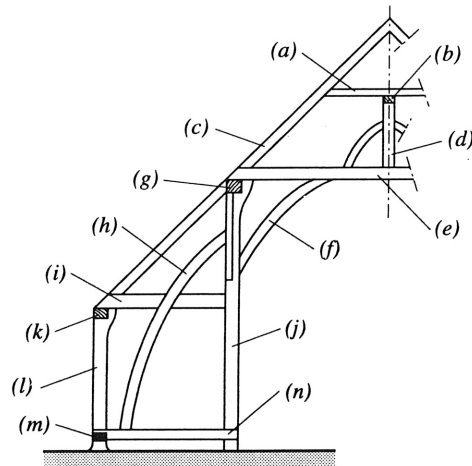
Aisled frame. (a) Collar, (b) collar plate, (c) rafter, (d) crown post (e) tie beam, (f) arch brace, (g) roof plate, (h) shore, (i) aisle tie, (j) aisle post, (k) aisle plate, (l) wall post, (m) sole plate, (n) post plate.
